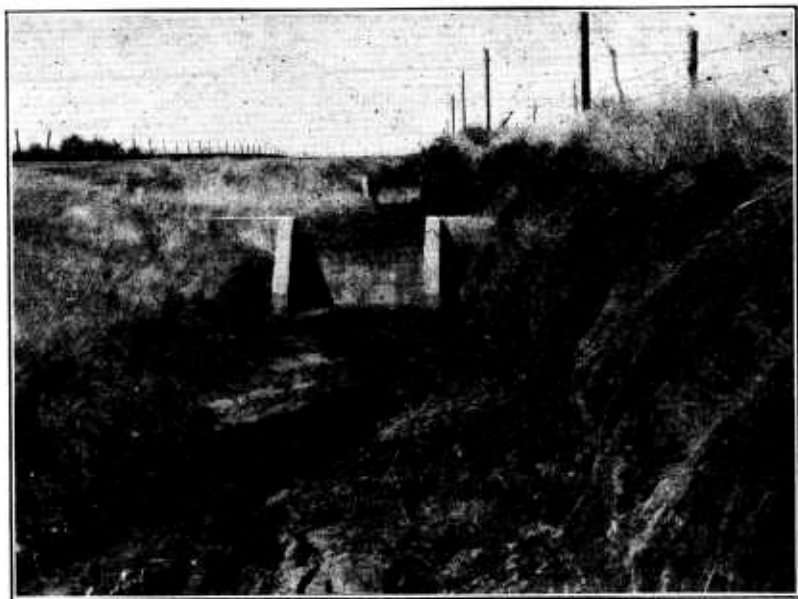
Series of reinforced concrete dams used to check erosion in a highway ditch
